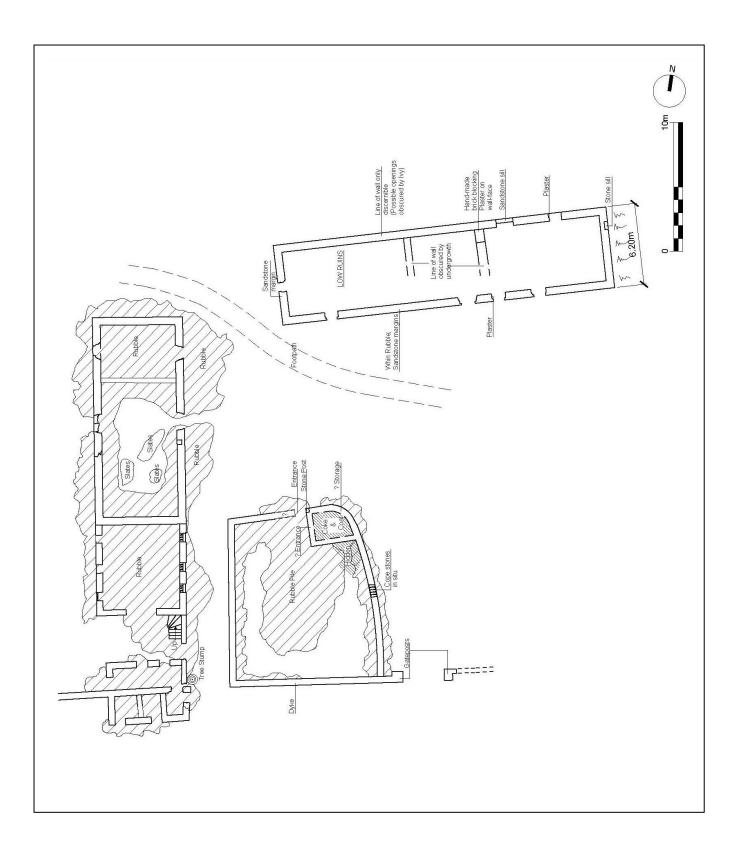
Former Offices and Steadings Plan (Source: Paul Hogarth)
